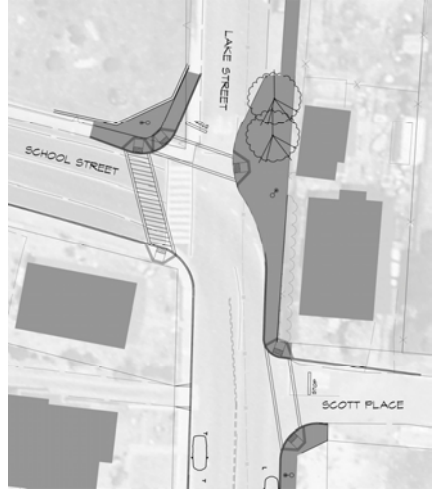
Proposed Intersection Re-Alignment at School Street/Lake Street
